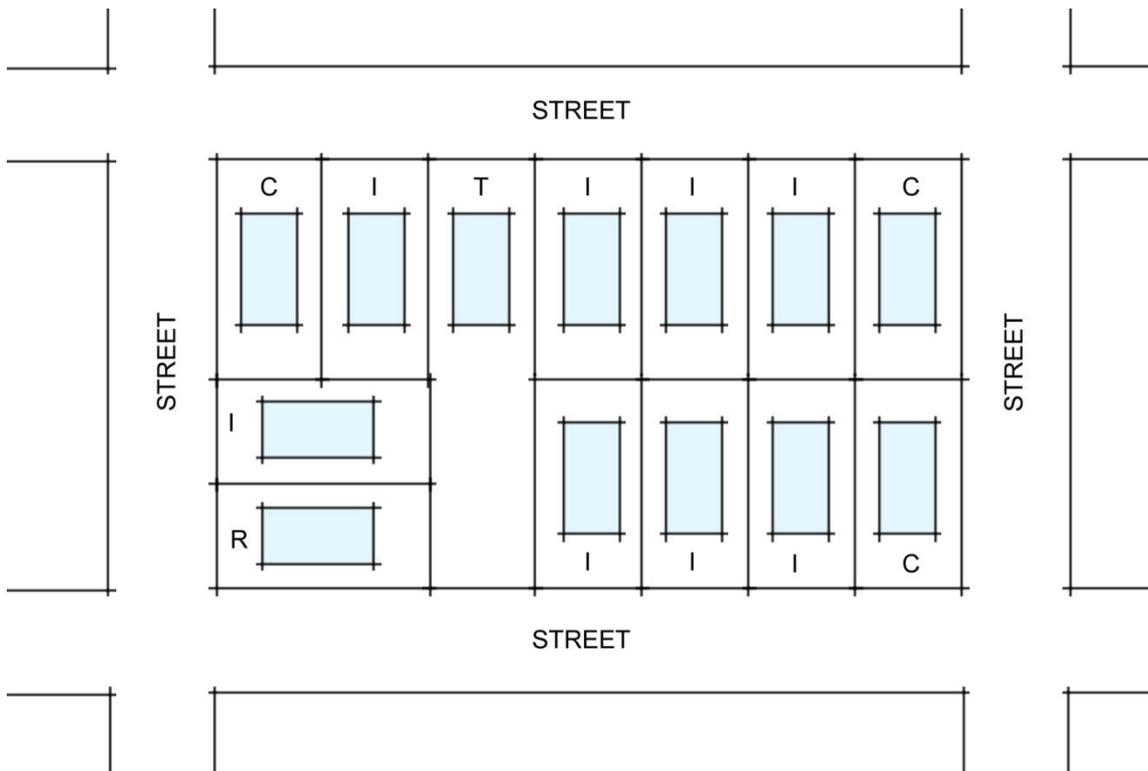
Site Types: (C) corner site, (I) interior site, (R) reverse corner site and (T) through site
